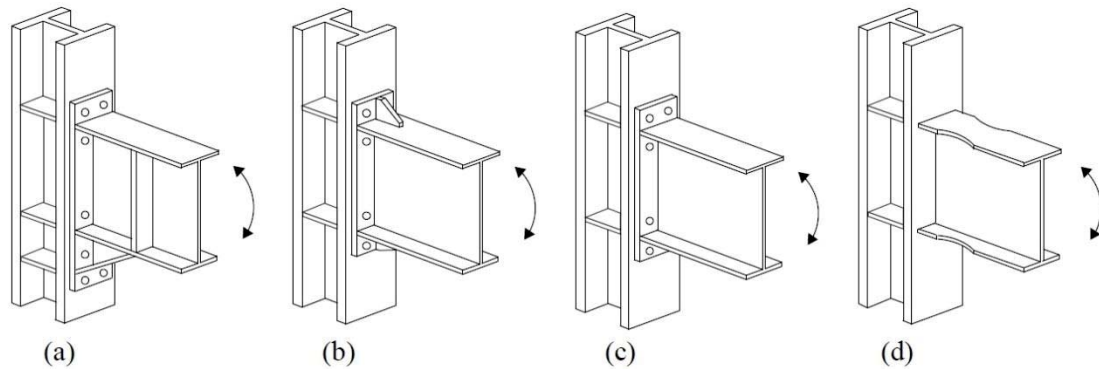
Beam-to-column joints investigated in the framework of EQUALJOINTS project: a) Bolted haunched joints; b) Bolted extended stiffened end-plate joint; c) Bolted extended unstiffened end-plate joint; d) Welded dog-bone joint
